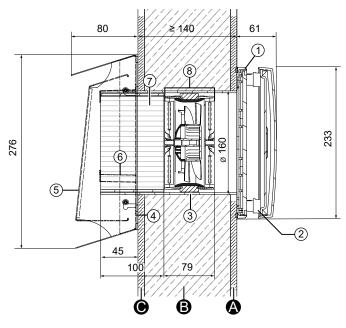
Sectional drawing of the iV-Compact ventilation device with Compact weather protection hood
